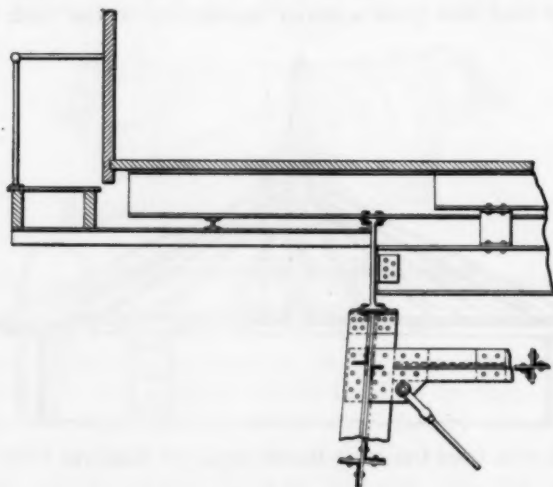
DETAIL VIEW OF ARRANGEMENT OF STEEL I-BEAM GRILLAGE FOR SUPPORT OF TANK
